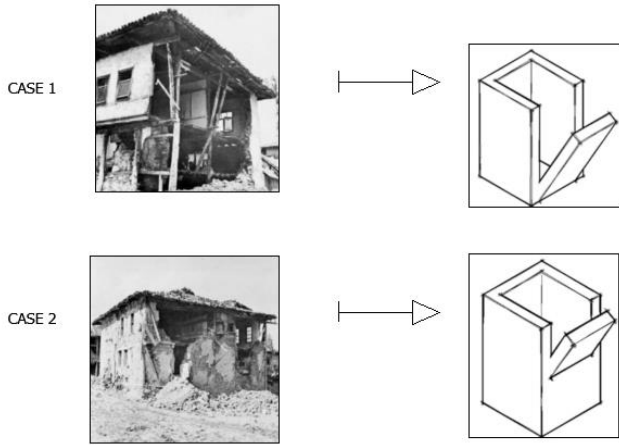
Failure mechanisms of the typical masonry and wooden frame combined houses.
